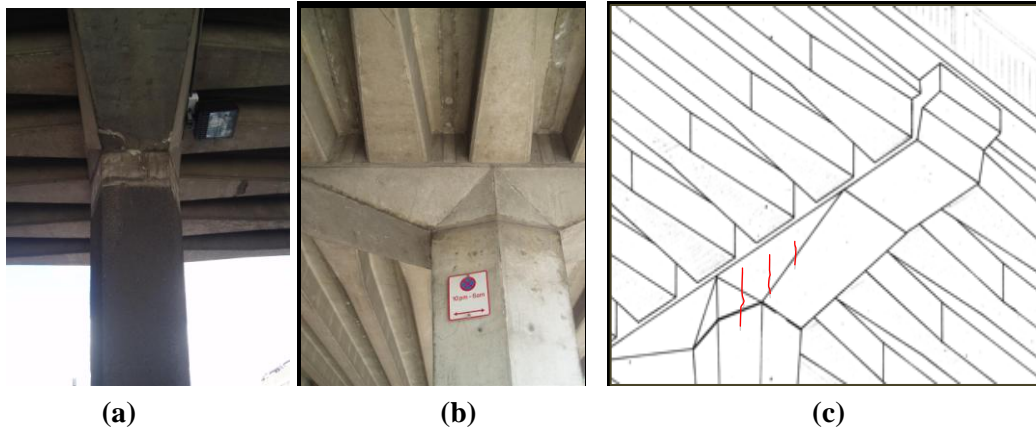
(a) Spalling on the northern face on the capping beam above south column of pier 6. (b) Vertical cracking in pier cap due to transverse movement. (c) Sketch of location of fine vertical cracking
